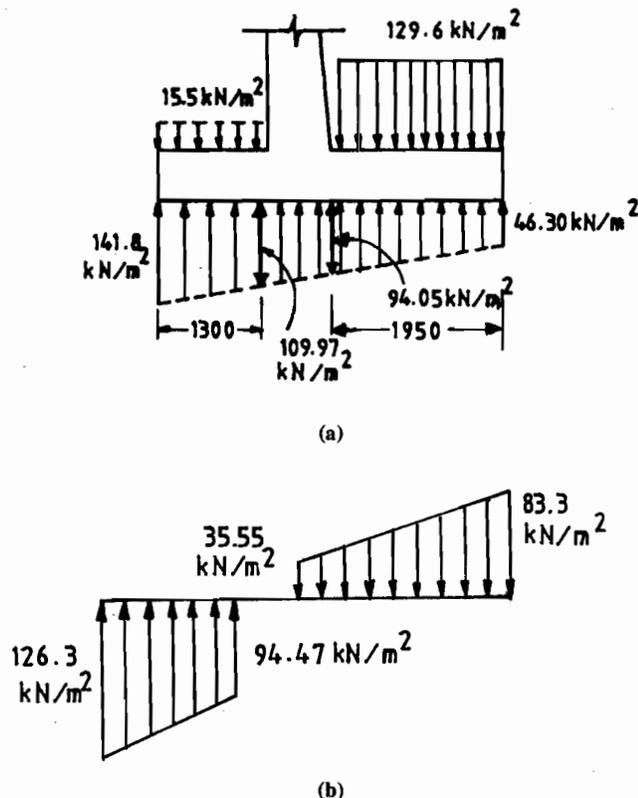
Net Soil Pressure Acting on Base Slab
